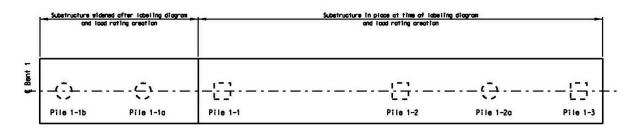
Labeling Convention for Widened Substructure with Added Piles
